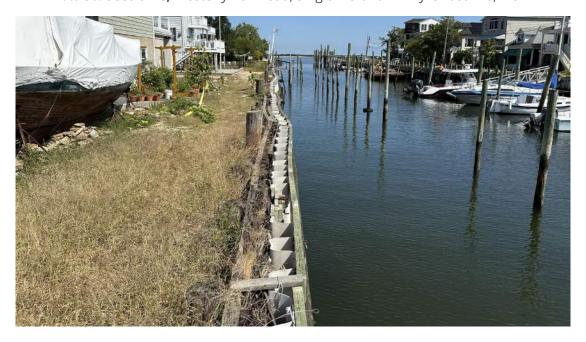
Section C, Westerly Bulkhead, Bulkhead Line, View 1
